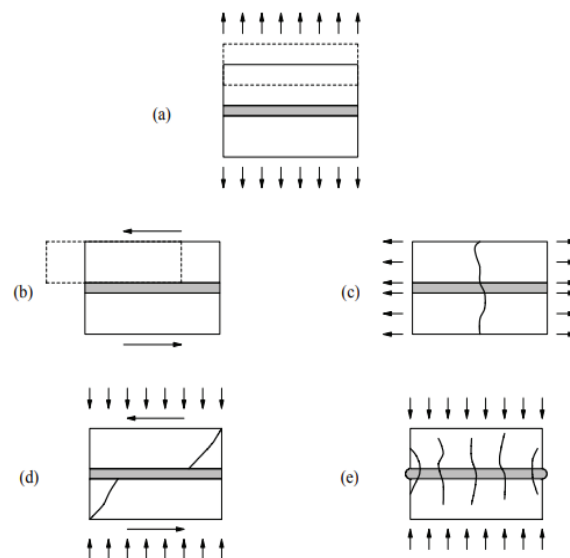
Masonry failure mechanisms (a) joint tensile cracking; (b) joint slipping; (c) unit direct tensile cracking; (d) unit diagonal tensile cracking; (e) masonry crushing
